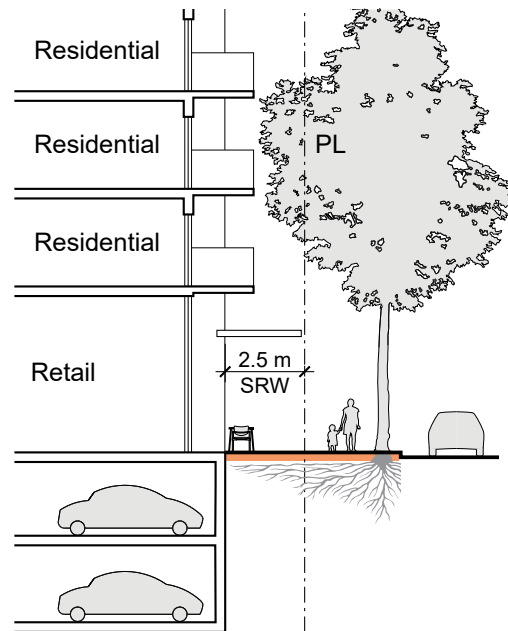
The front yard is intended to accommodate a statutory right-of-way for sidewalk widening. Underground parkades are set back to retain existing high value street trees.
